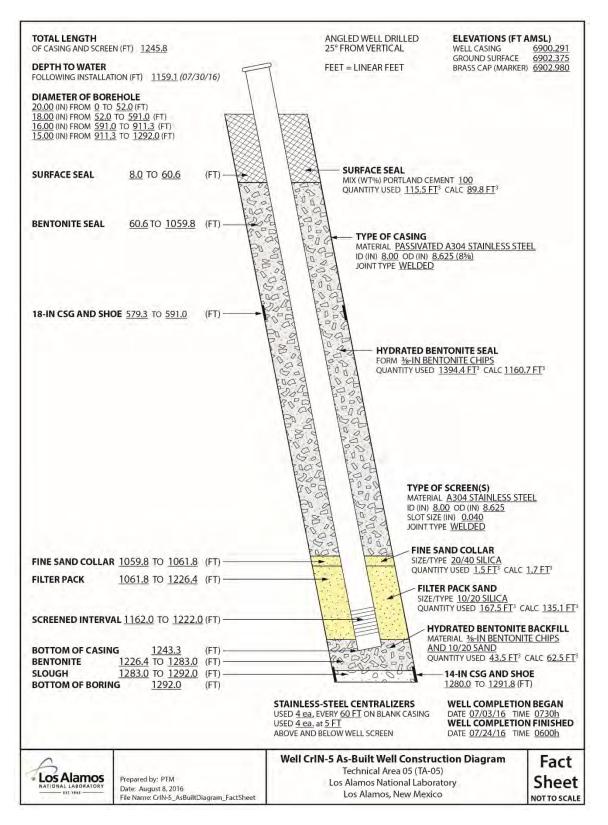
Injection well CrIN-5 as-built well construction diagram
